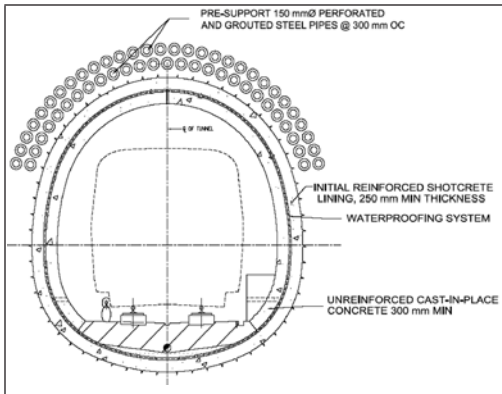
NATM tunnel with double pipe arch pre-support for shallow tunneling
